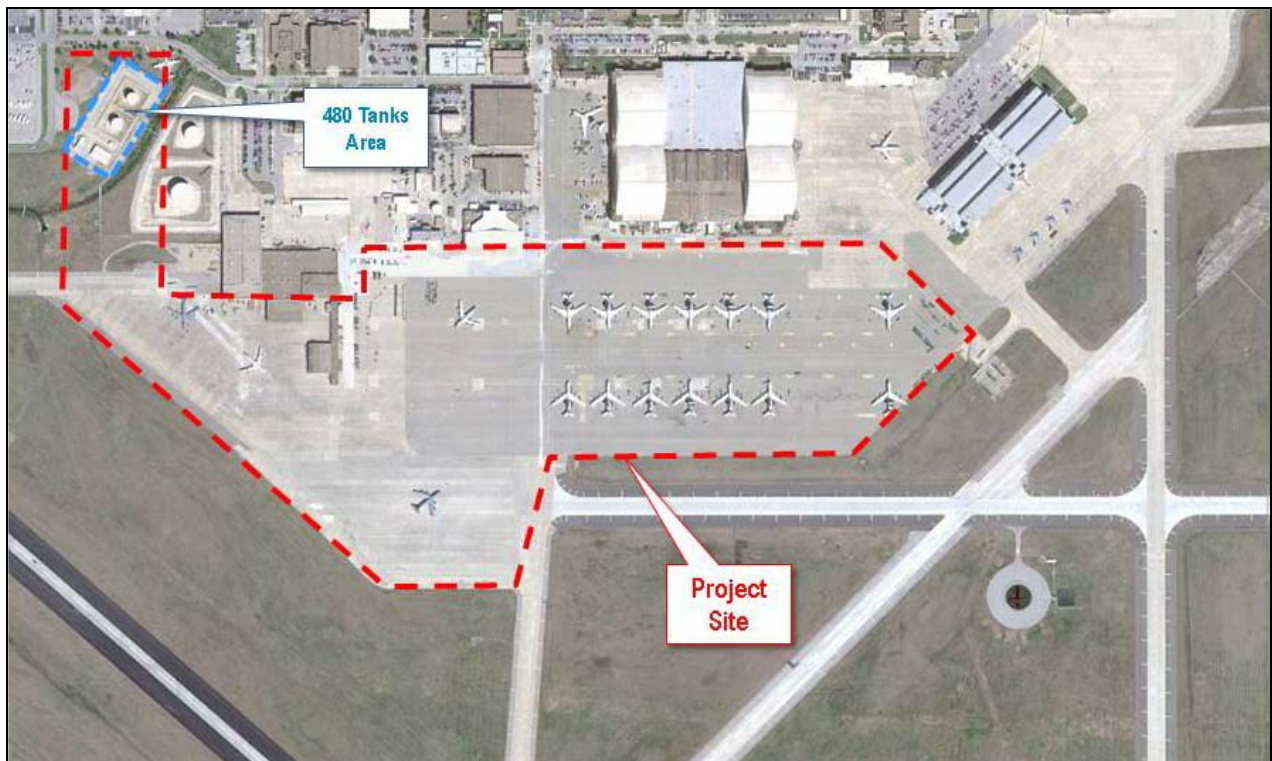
Site Layout for Replacement of Type III Hydrant Fueling System
